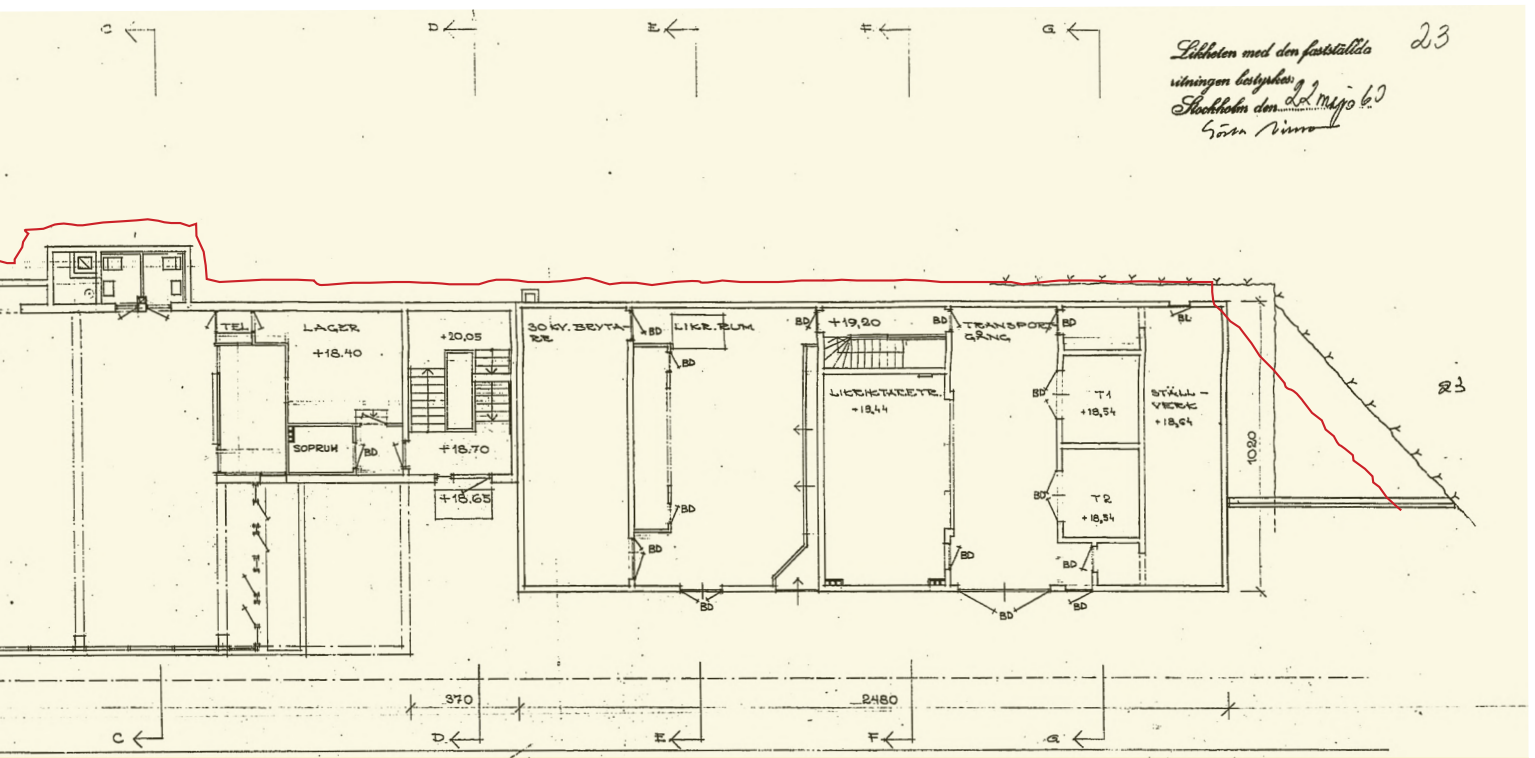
Original ground floor plan, 1963. Borgström, Lindroos-Rosén. 1:100
